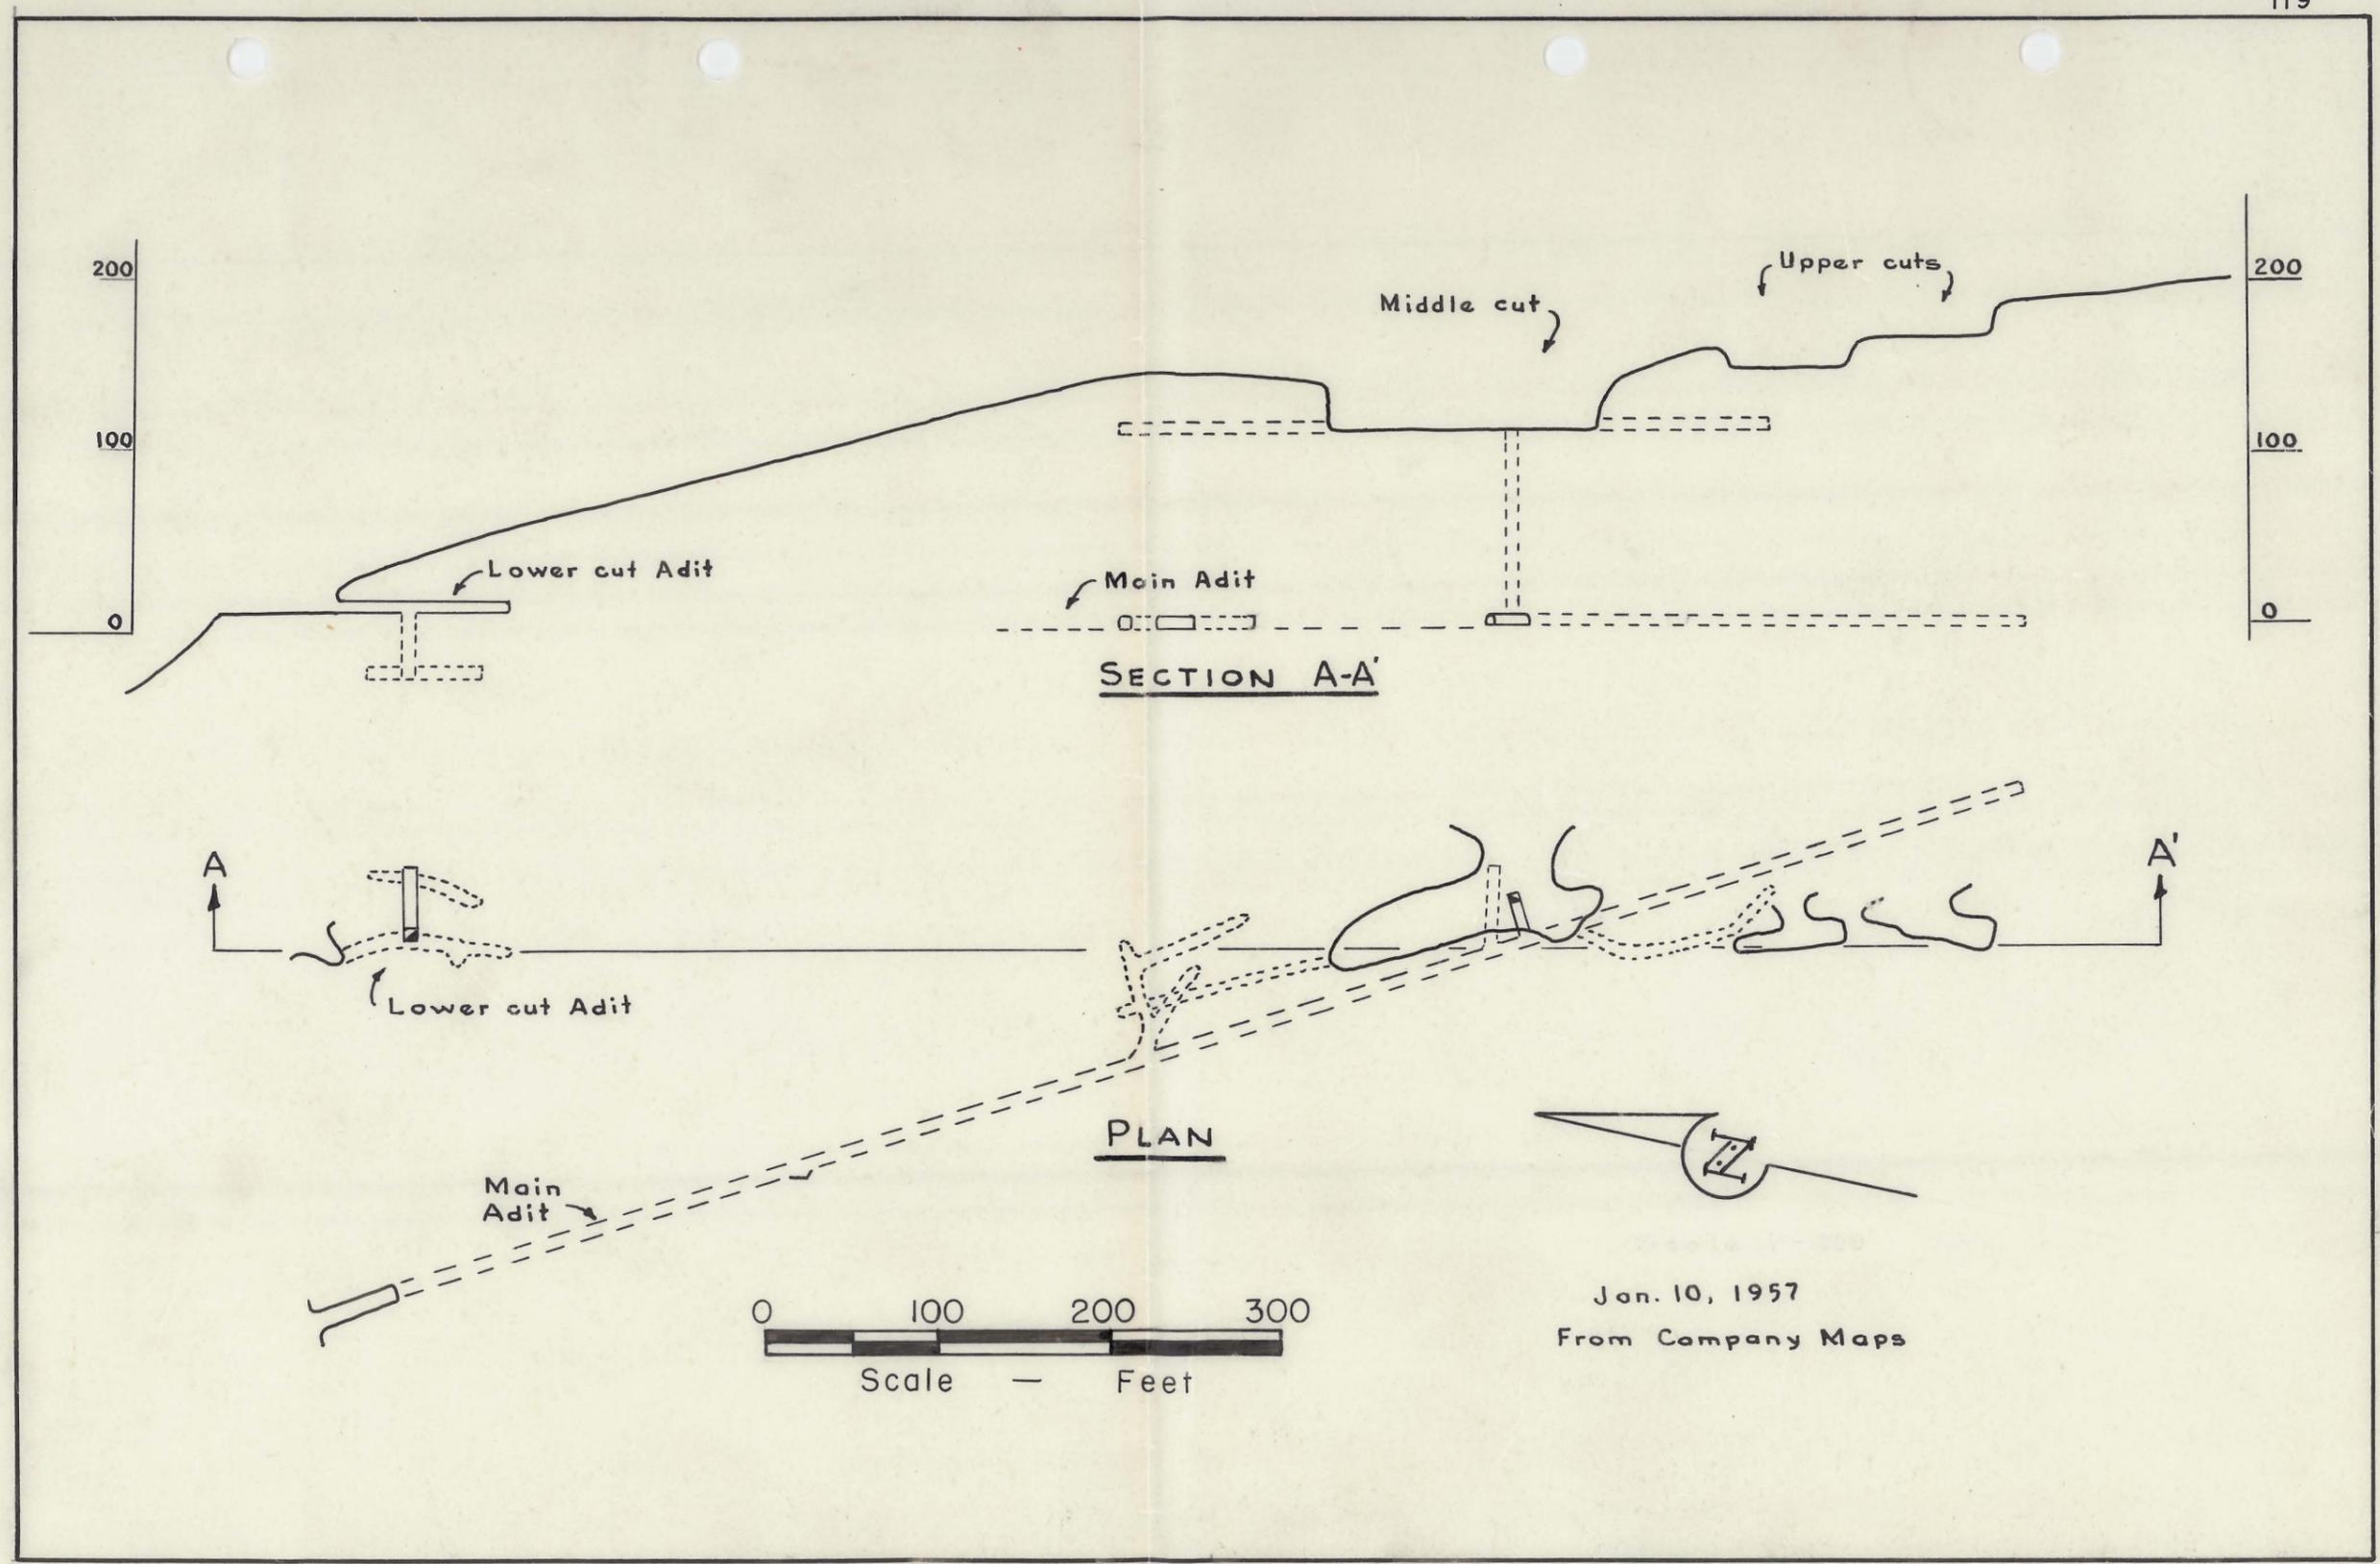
PLAN AND SECTION, BIG BANANA MINE
